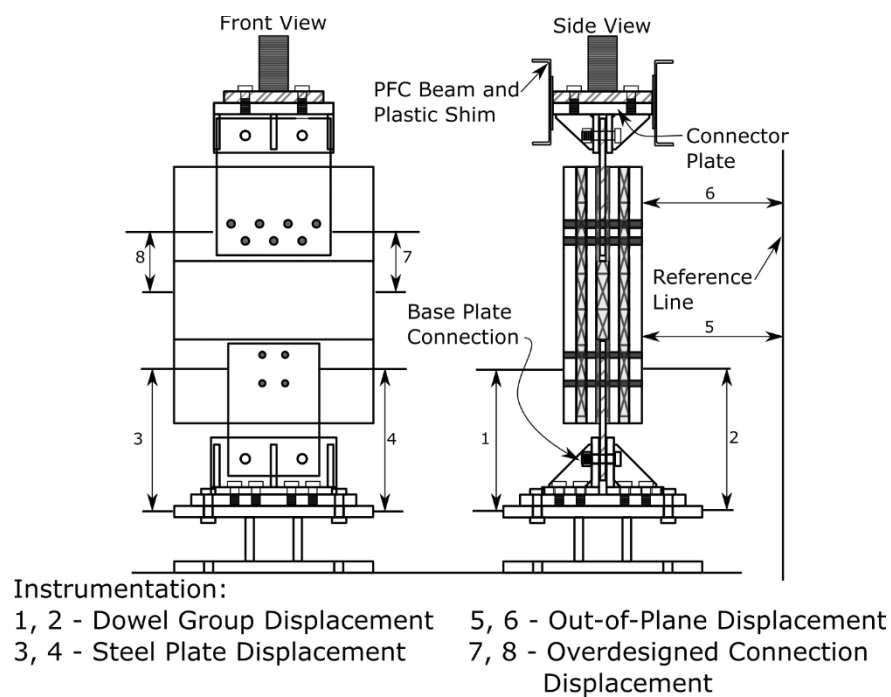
Specimen instrumentation – CLT7 joint specimen shown
